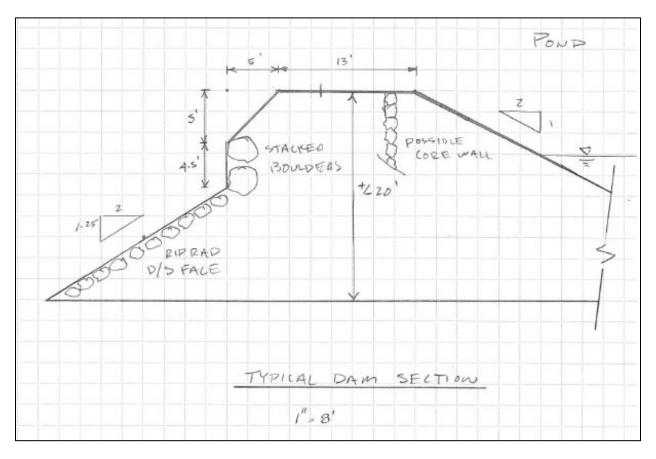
Engineer's sketch of a typical cross section of the main section of dam
